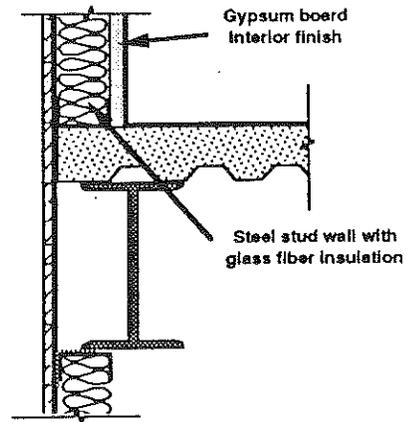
Steel stud wall/floor intersection (Steven Winter Associates 1989).
